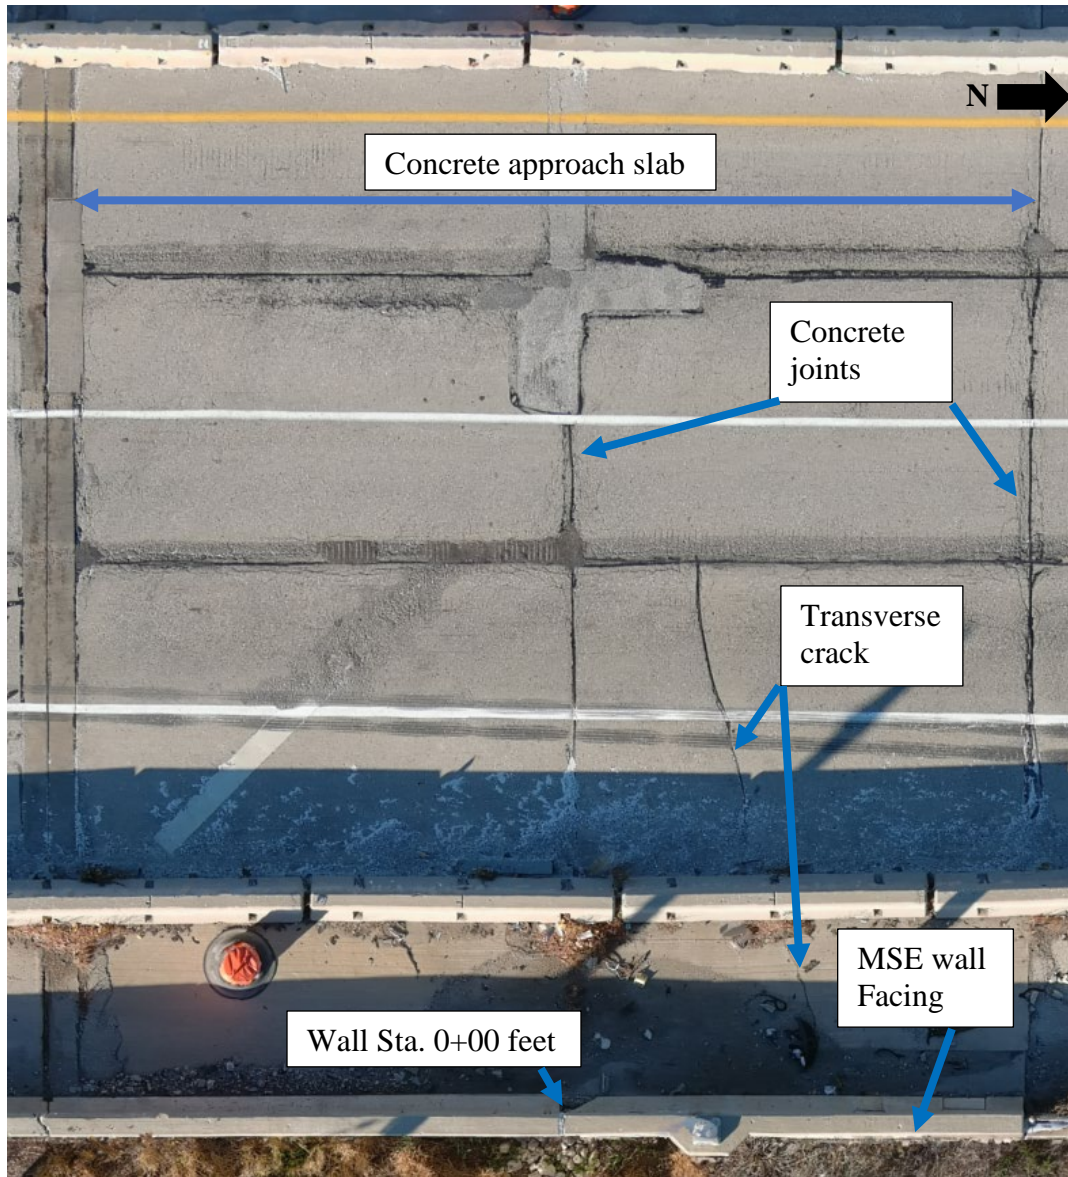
The aerial photograph taken by WisDOT in November 2023 showing the top of the bridge approach slab, MSE wall, and I-43 traffic lanes.
